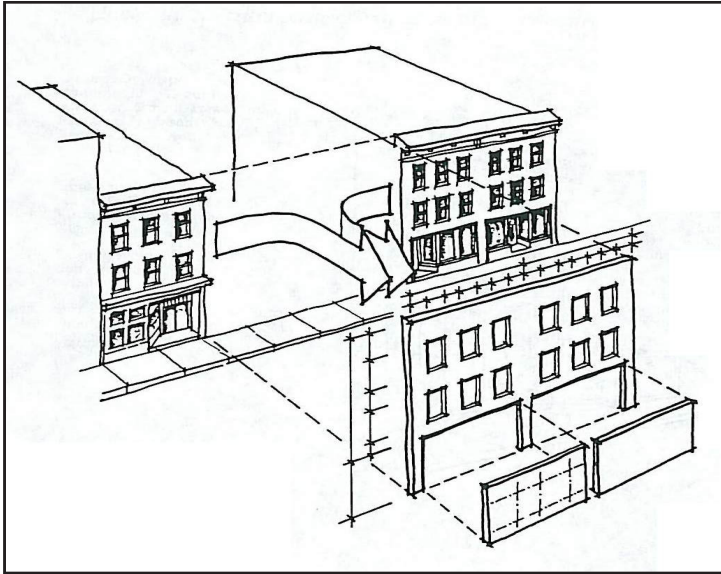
Windows should maintain size and spacing of adjoining buildings
